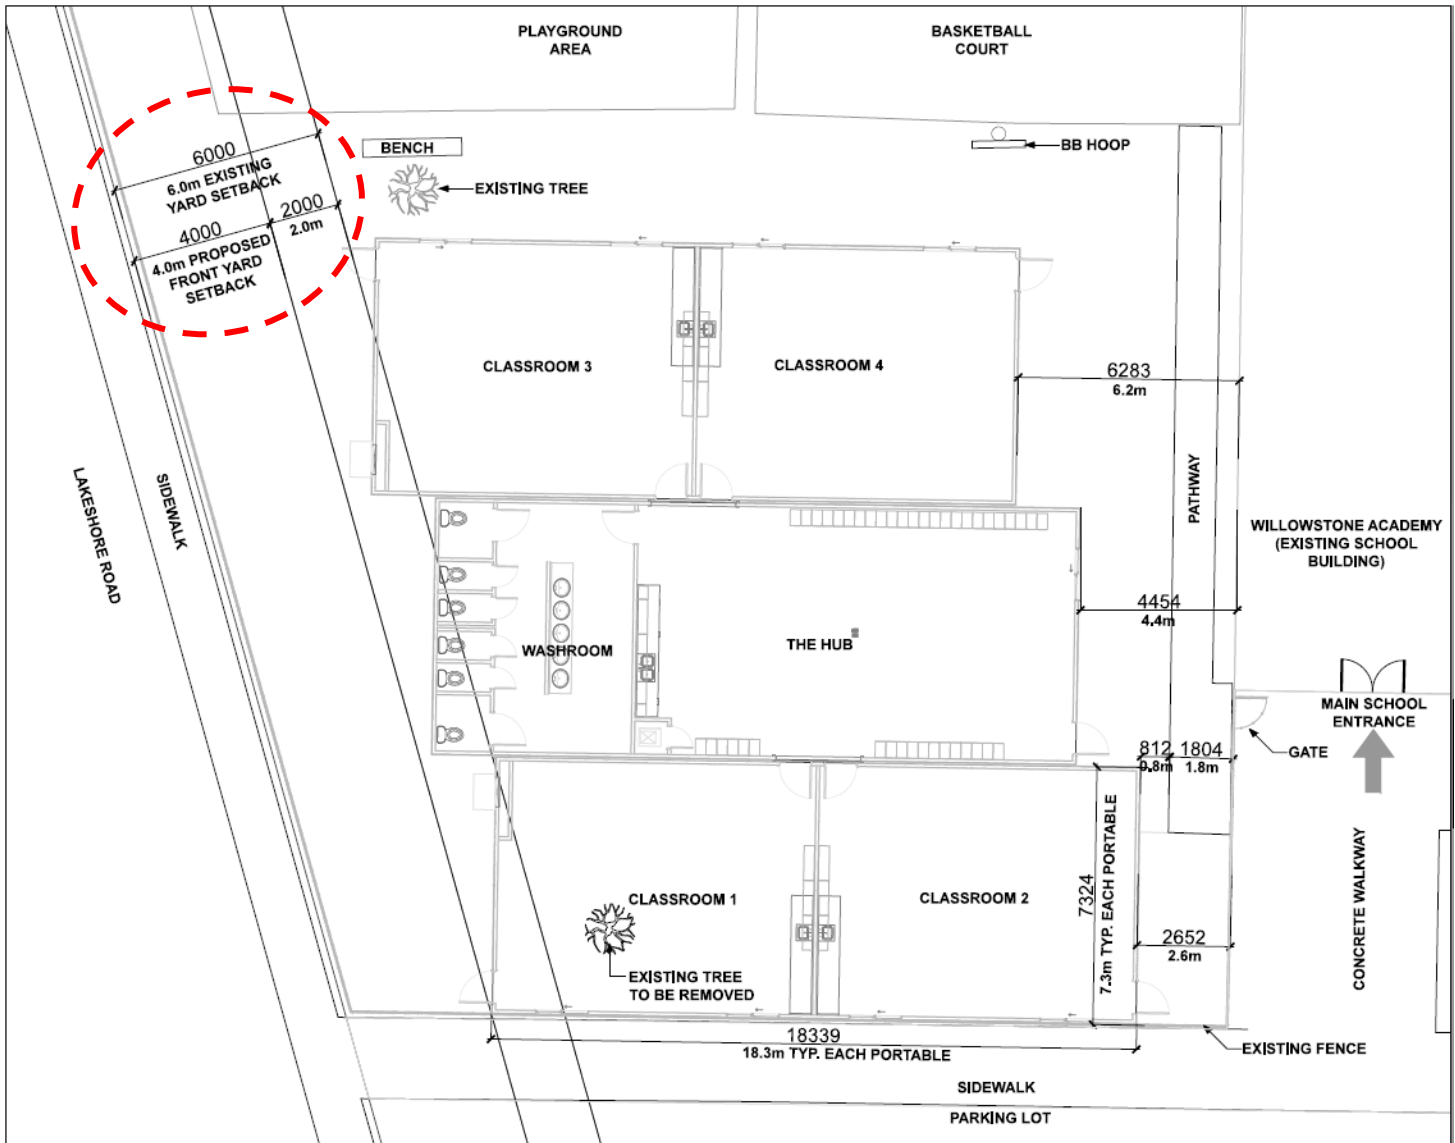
Willowstone Academy Portable Classrooms proposed location.
